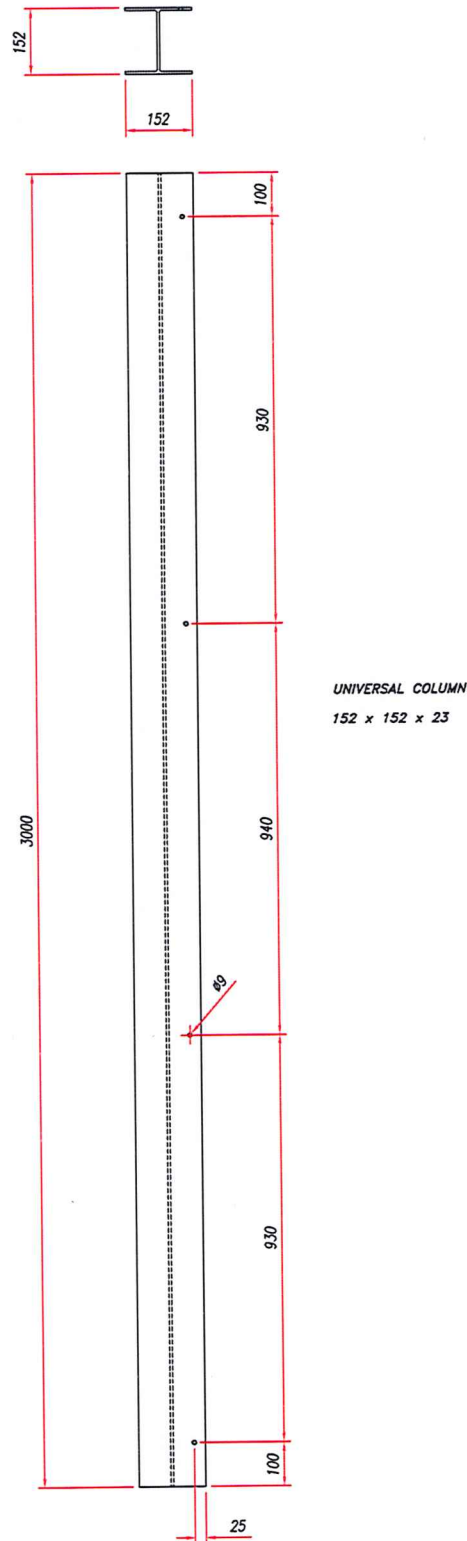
Technical drawing provided by the client – steel post – load bearing component
